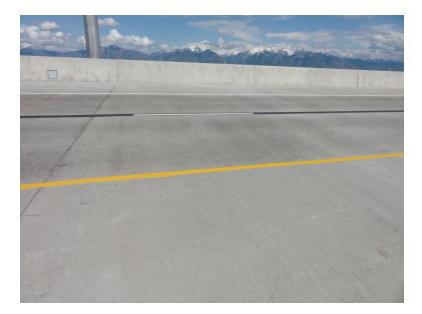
Reflection and map cracking in 8200 South northbound conventional concrete deck at 1 year.
